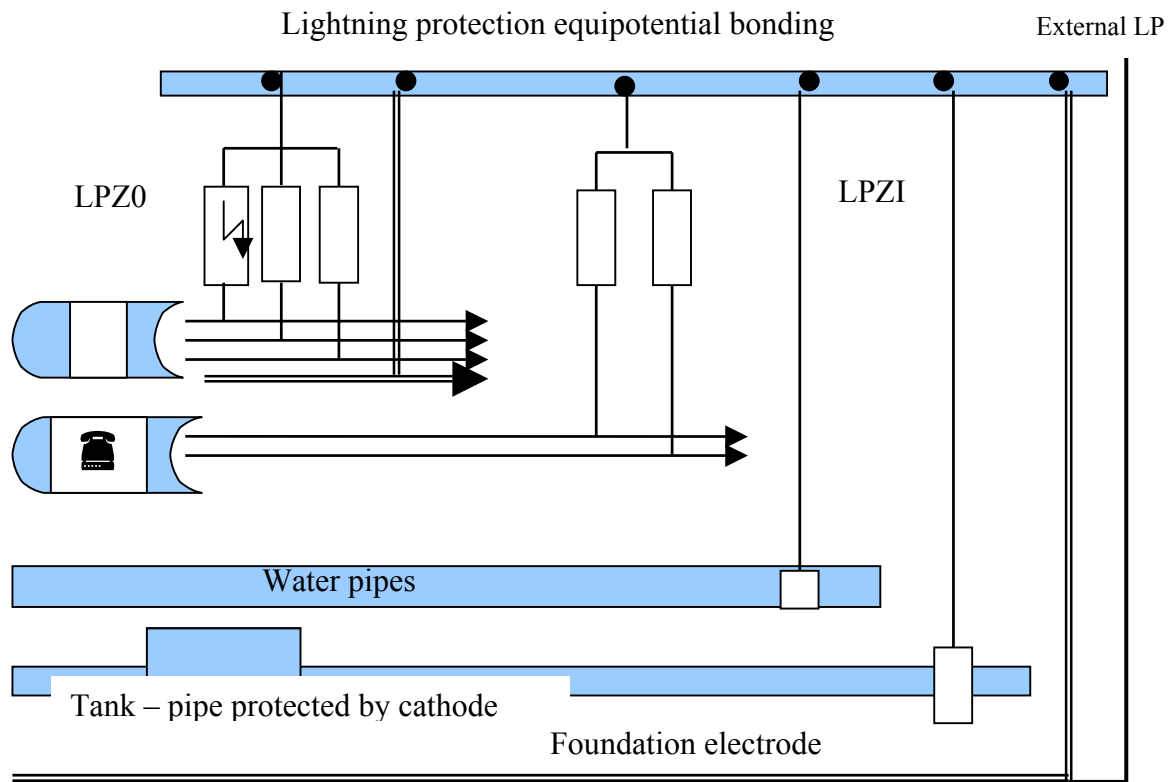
lightning protection equipotential bonding for public services entering the building
